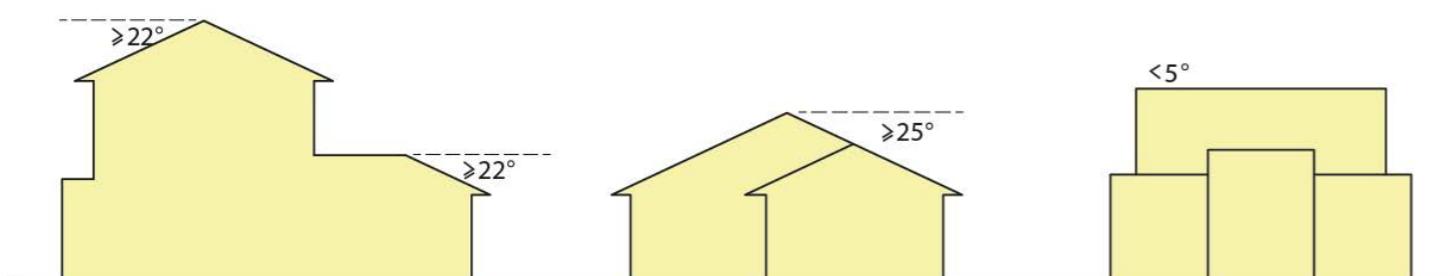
The roof pitch on single storey houses must be at least 25° or less than 5° . The roof pitch on houses with upper levels must be at least 22° or less than 5° .
